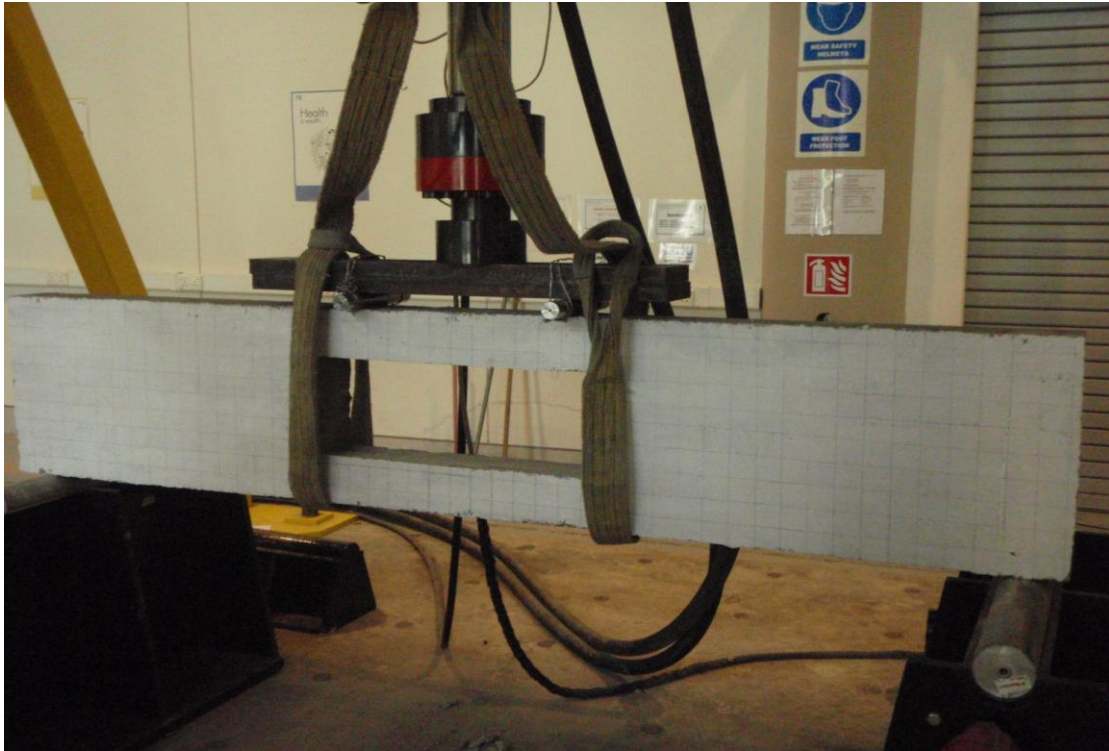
Beam with Rectangular Opening with Additional Reinforcement Bars along the Edges on Testing Machine before Load is being applied
